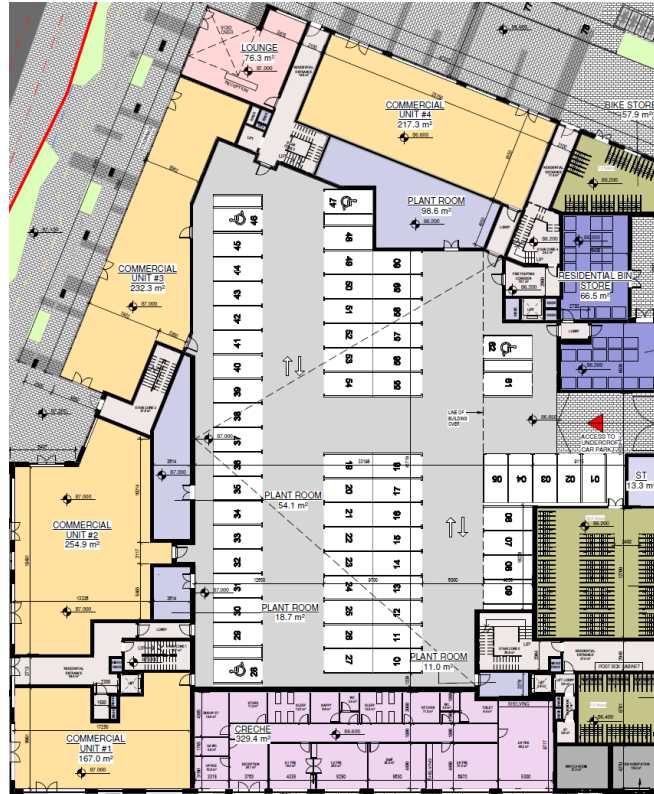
Ground floor plan. We note provision of car parking (62 no. spaces inclusive of 4 no. accessible spaces, bicycle parking (348 no. spaces), a resident’s lounge, the creche facility, the 4 no. commercial units, the ESB substation and associated plant rooms.
